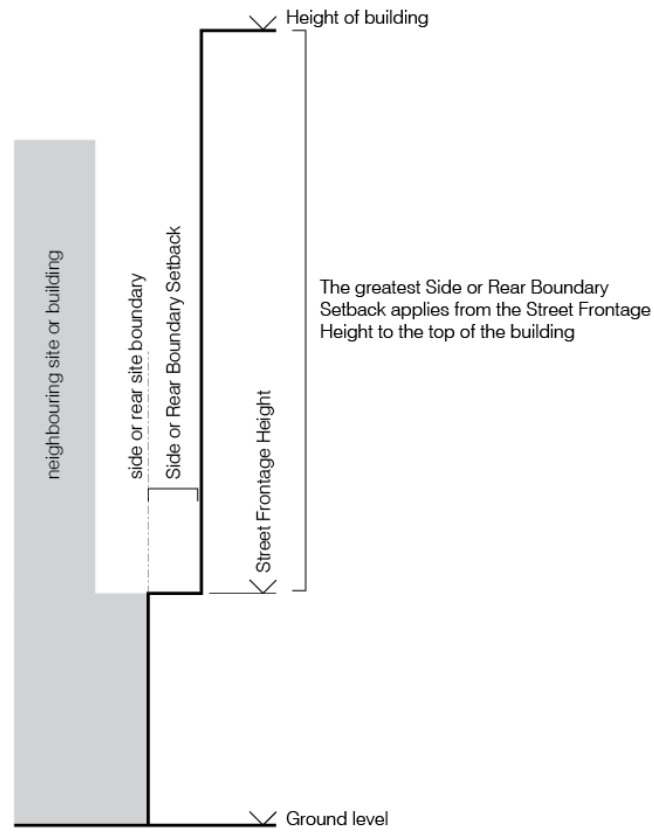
Minimum Side or Rear Setbacks above Street Frontage Height applied consistently to the top of the building
